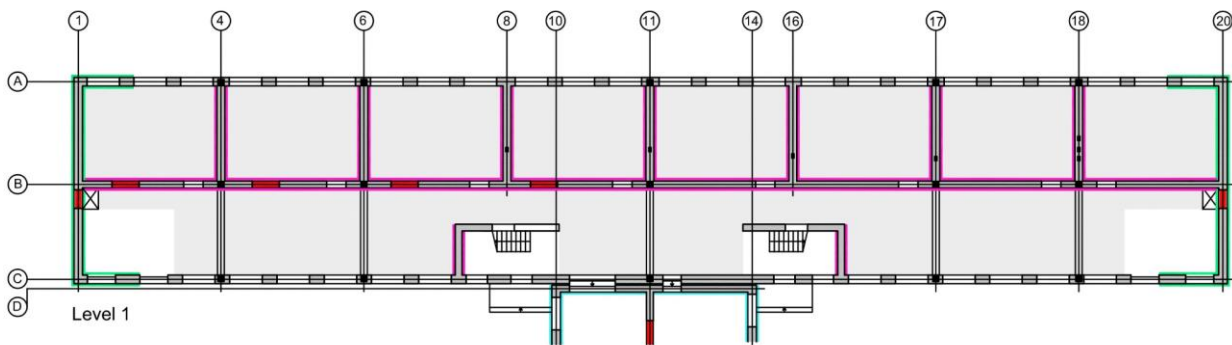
Ground floor plan showing the walls earmarked for RC jacketing [1, 18]
